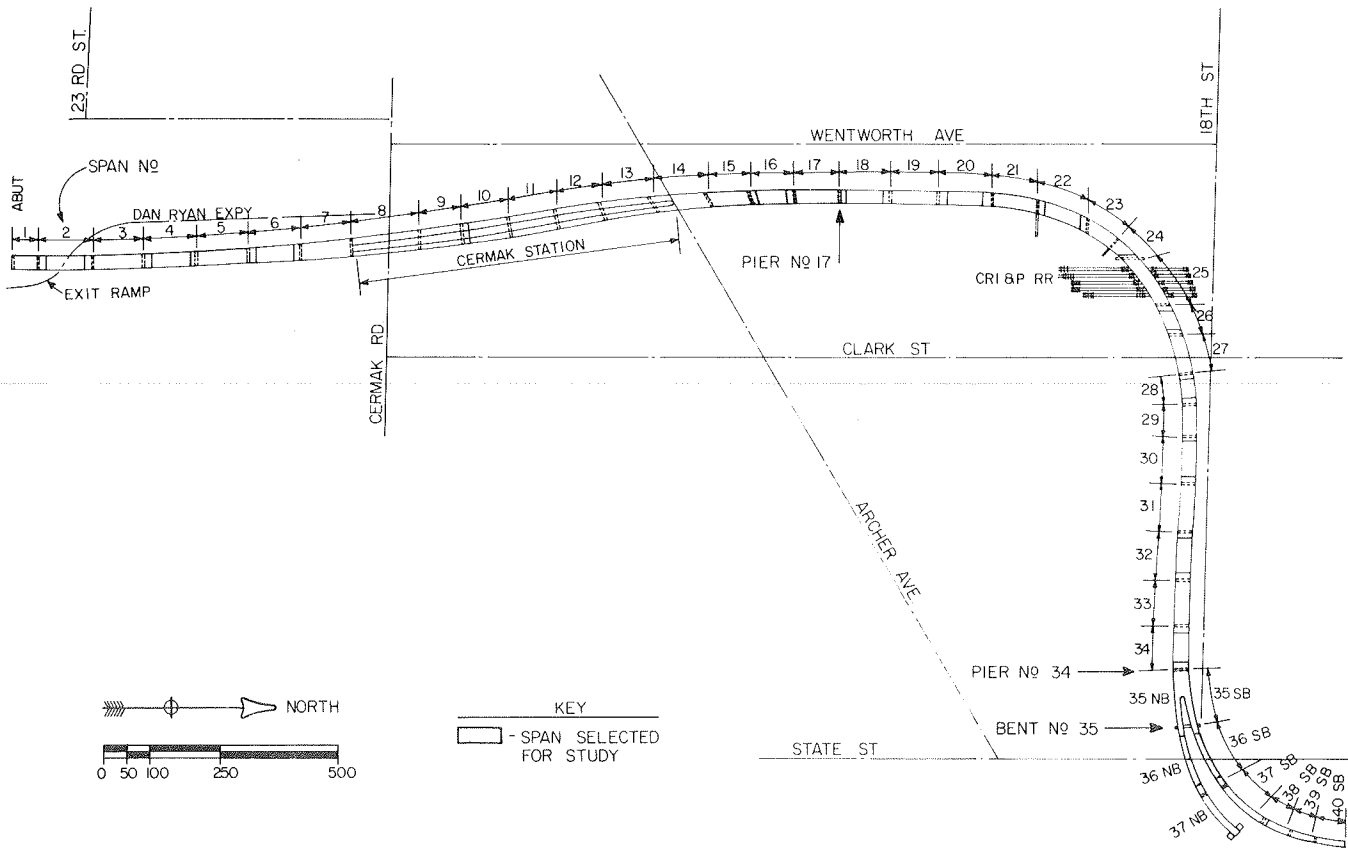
Plan of Dan Ryan elevated structure under study.
